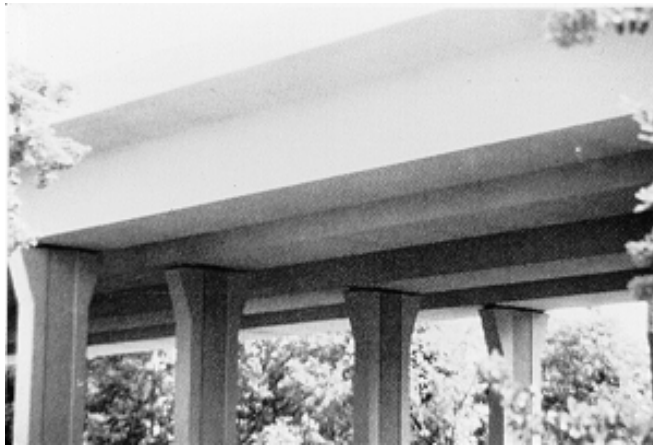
Individual columns supporting individual trapezoidal box girders
